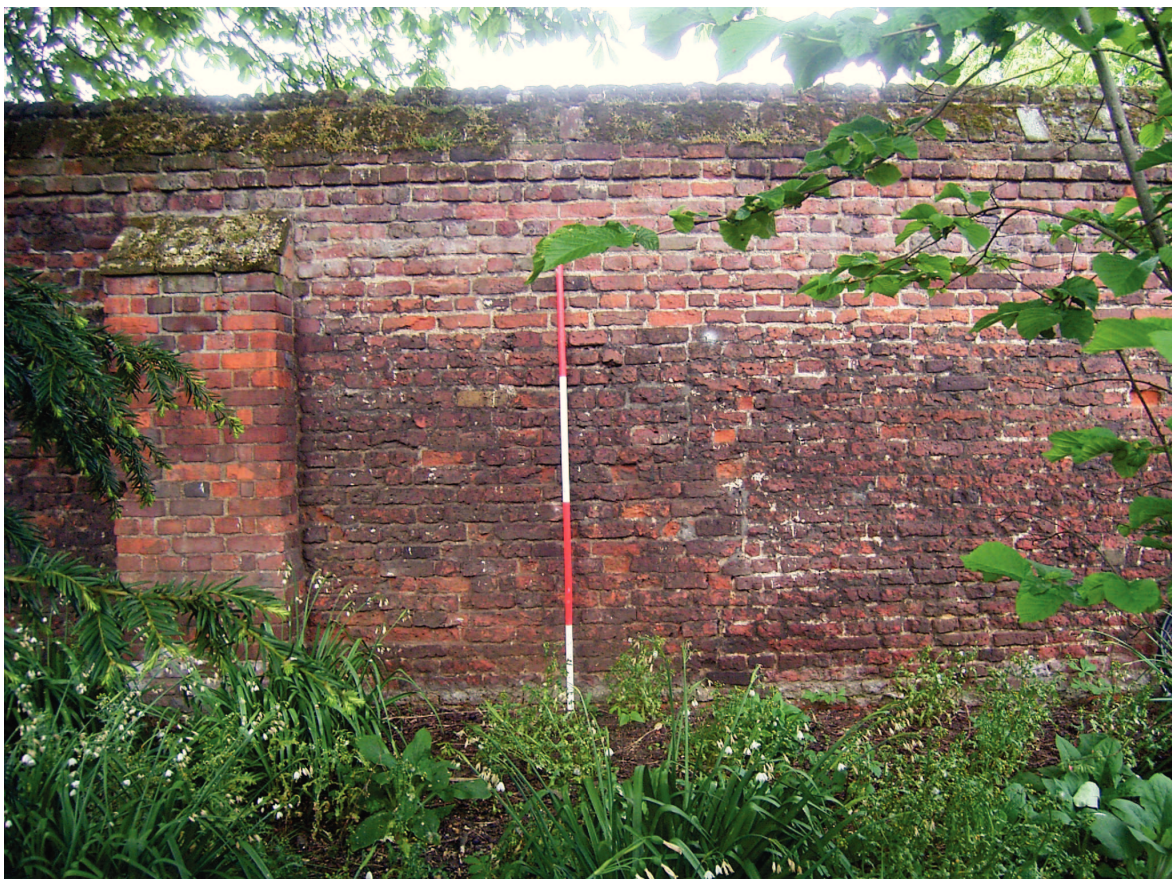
View of west elevation of wall within enclosed garden at entrance to car park
